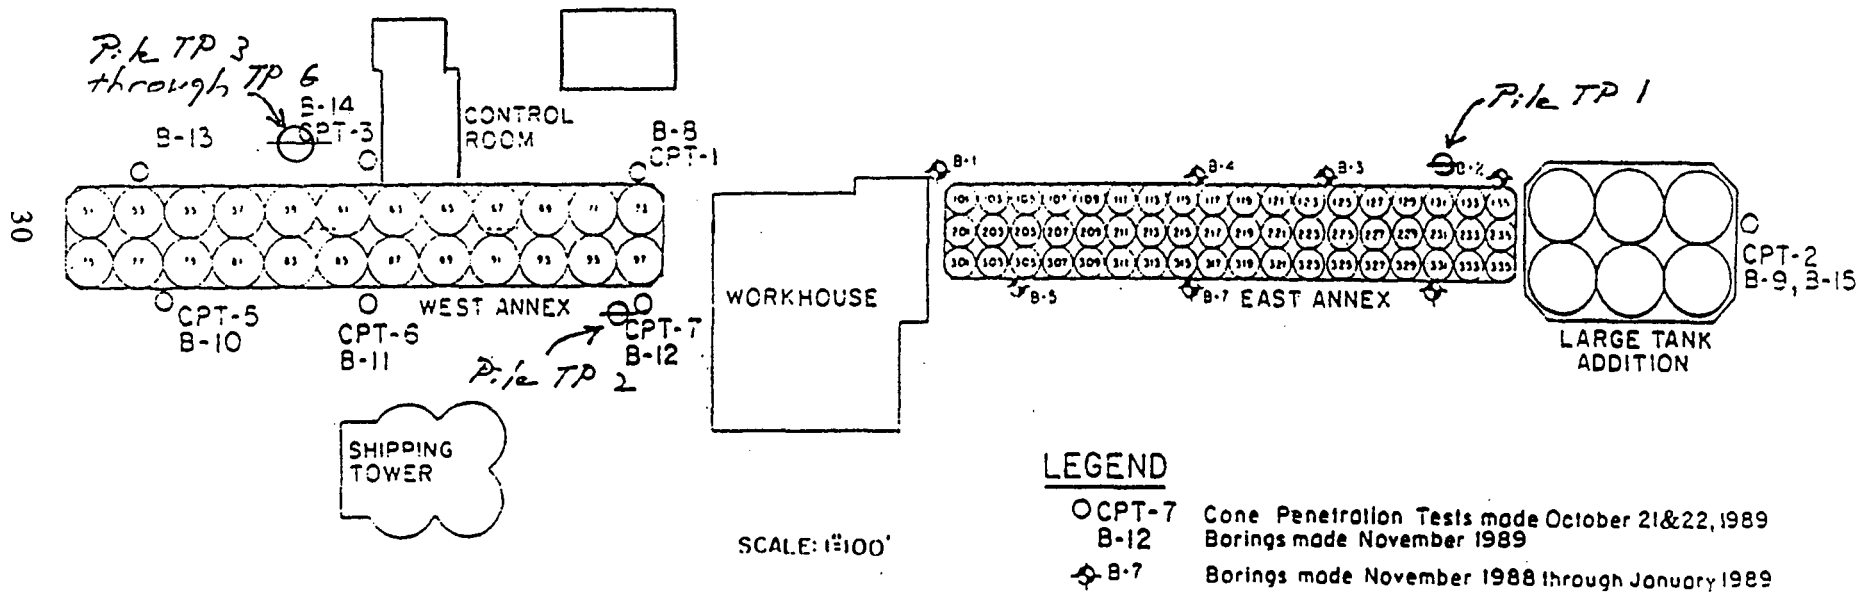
Plan of part of the United Grain facility, Vancouver, Washington, showing location of test piles (TP1-TP6) and site investigation holes.
